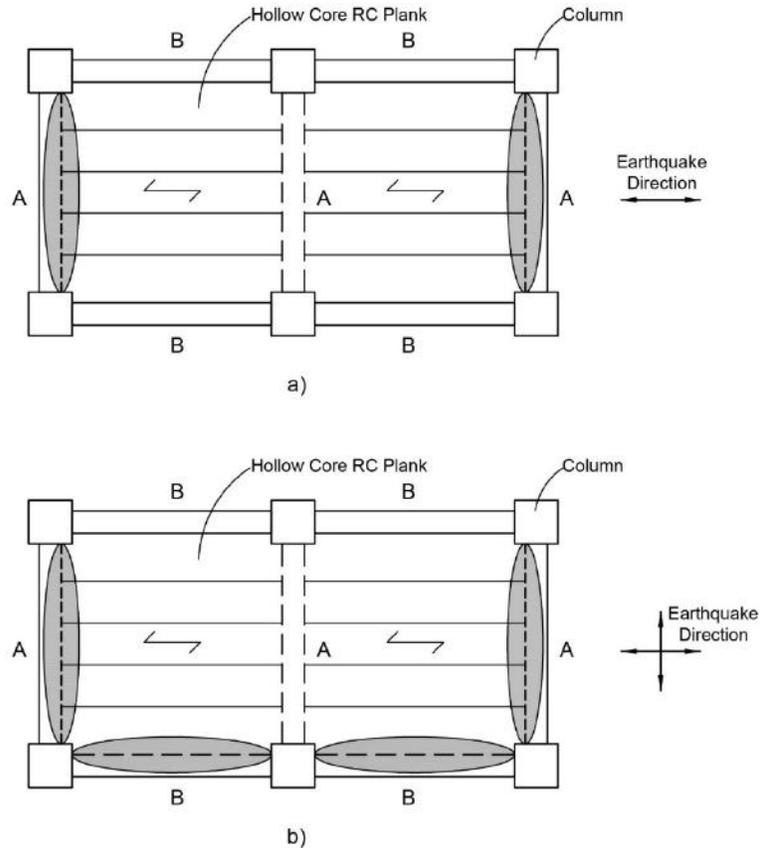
Regions of potential damage and loss of support in hollow core precast RC slabs – plan view: a) unidirectional earthquake action, and b) bi-directional earthquake action (based on Matthews, Bull, and Mander, 2001).
